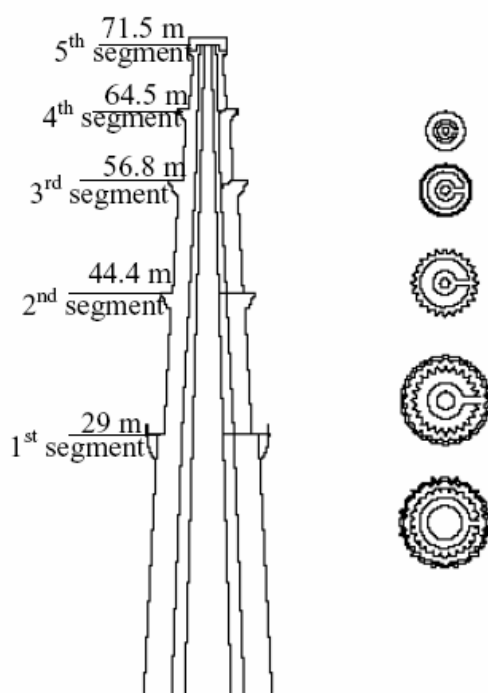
The sectional elevation and plan of the Minar at each storey level
